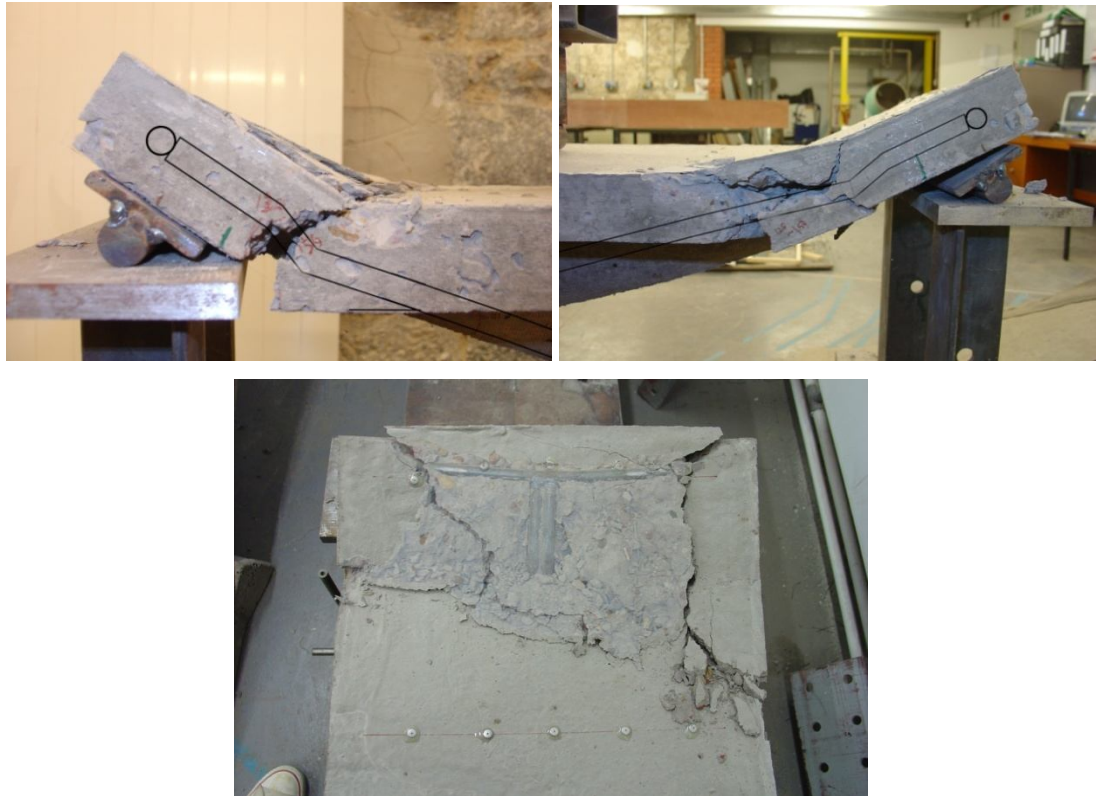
Beam 22SA10mm at failure; top surface (bottom), front side (left) and rear side (right)
